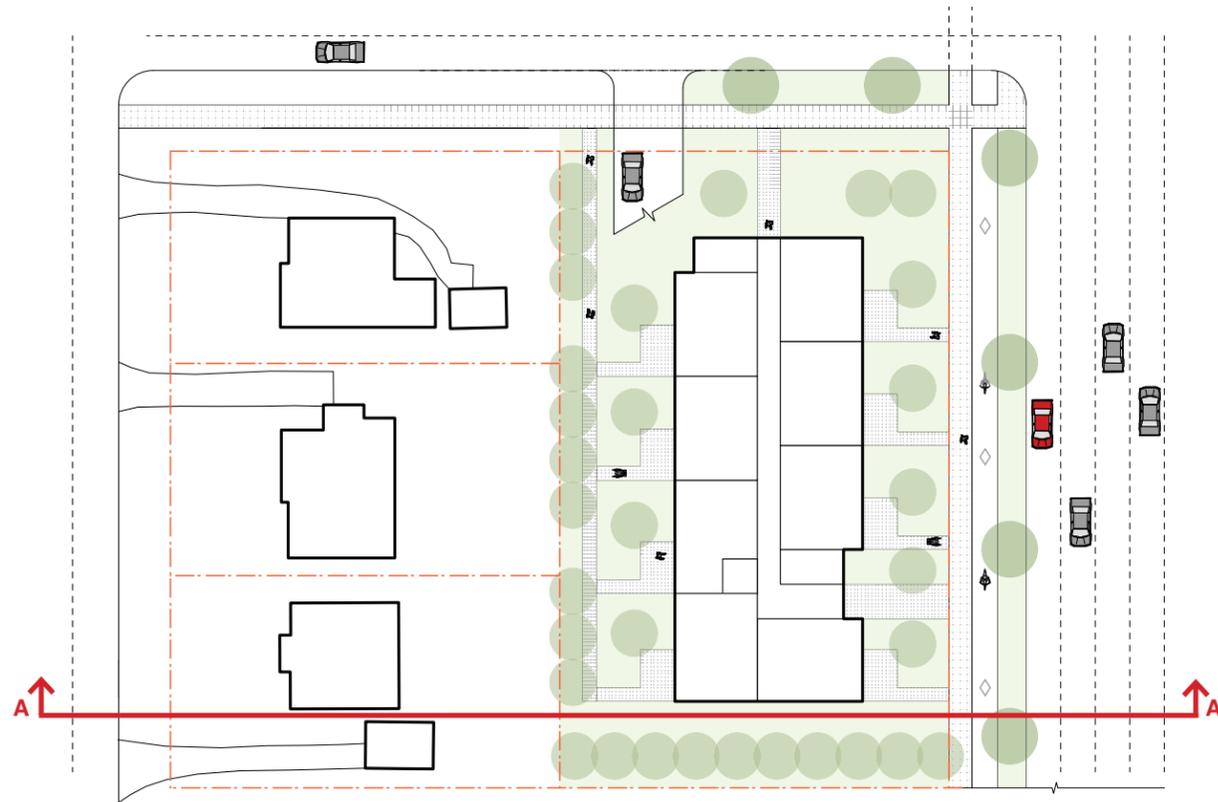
SAMPLE SITE PLAN (not to scale)
